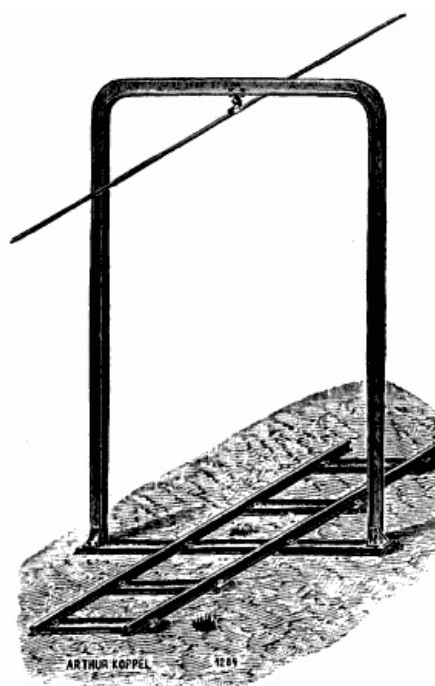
THE SECTION WITH THE SUPPORT FOR THE OVERHEAD LINE
